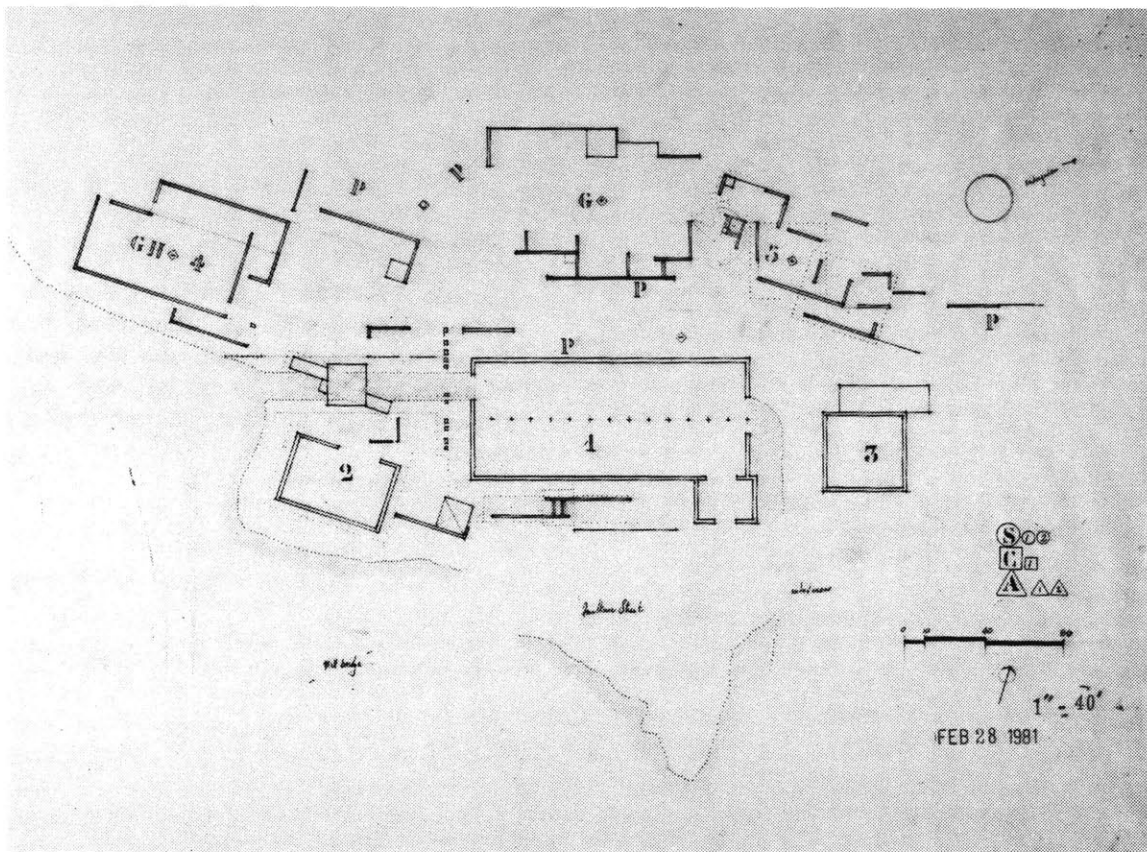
Site plan. Amplification of Figure 75. Buildings numbered 1-3 are the old buildings. Others are the greenhouses. P = parking. A bridge spans the old sluiceway.
